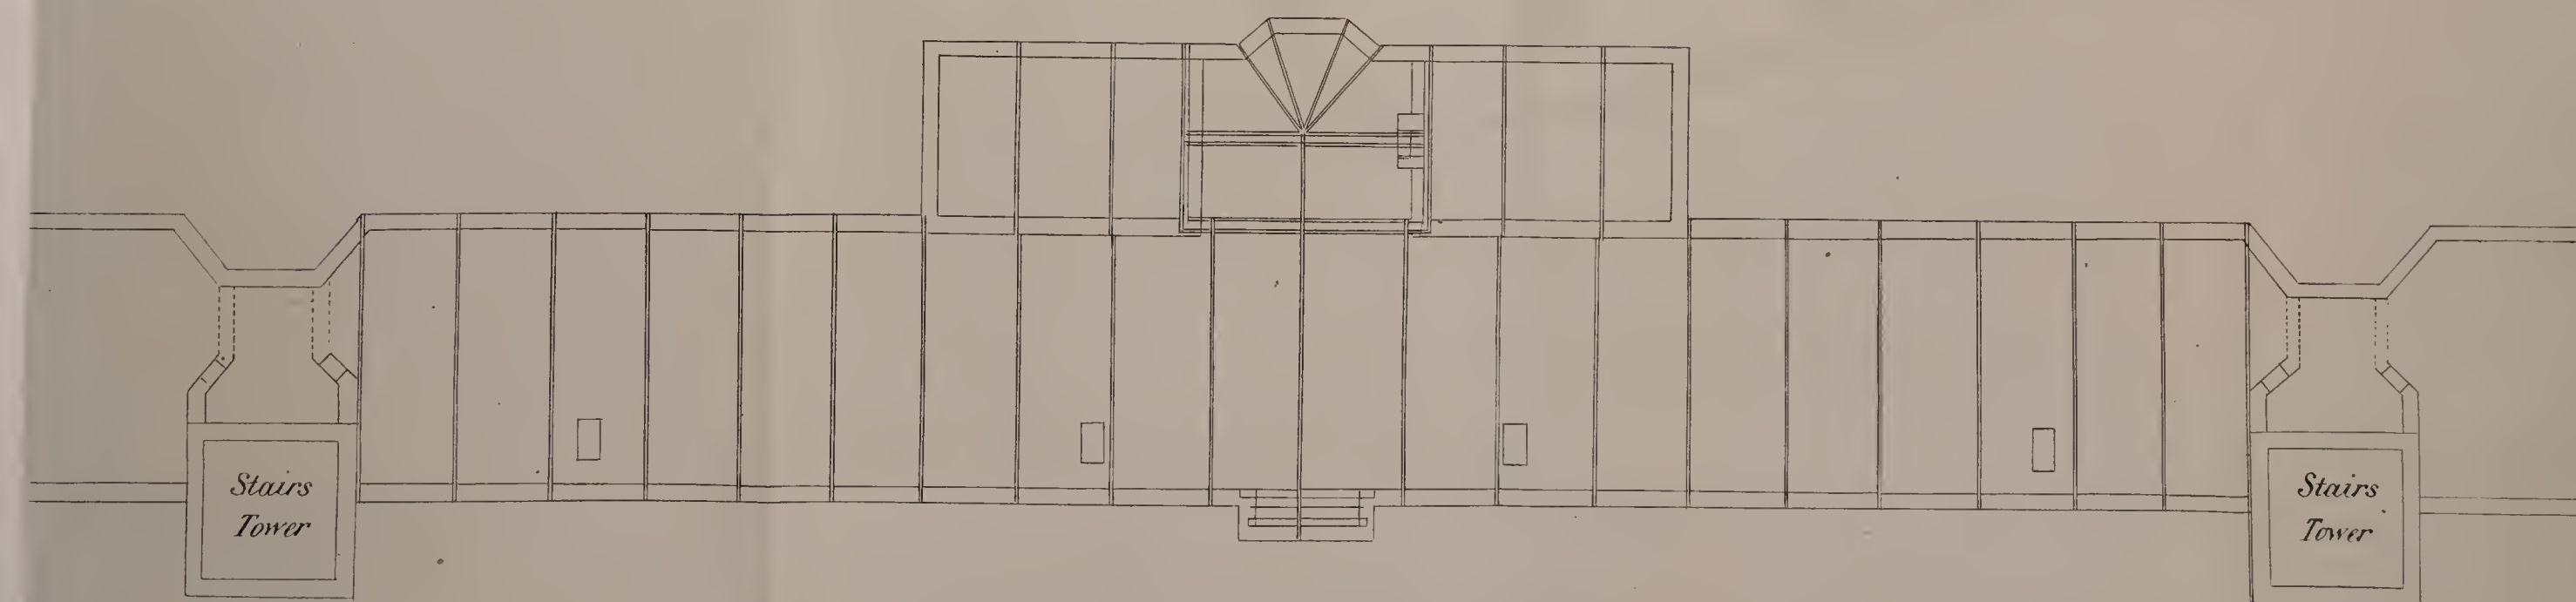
Plan of a Ward Roof, at the level of the Tie beams.
